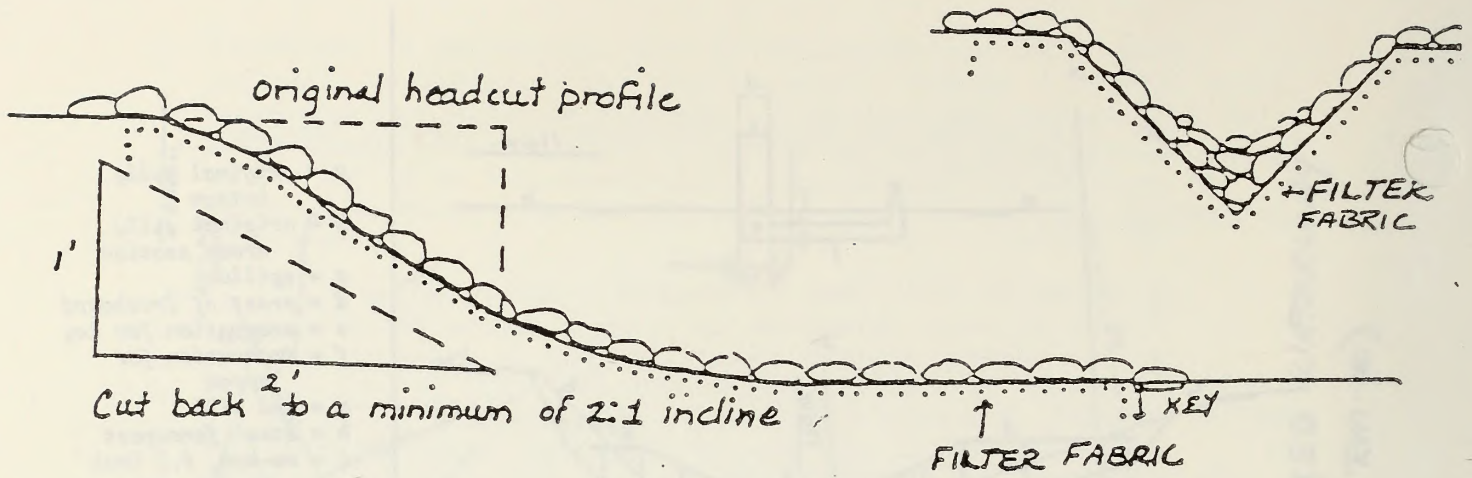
A. TYPICAL PLAN FOR HEADCUT CONTROL WITHOUT THE USE OF A CHECK DAM
